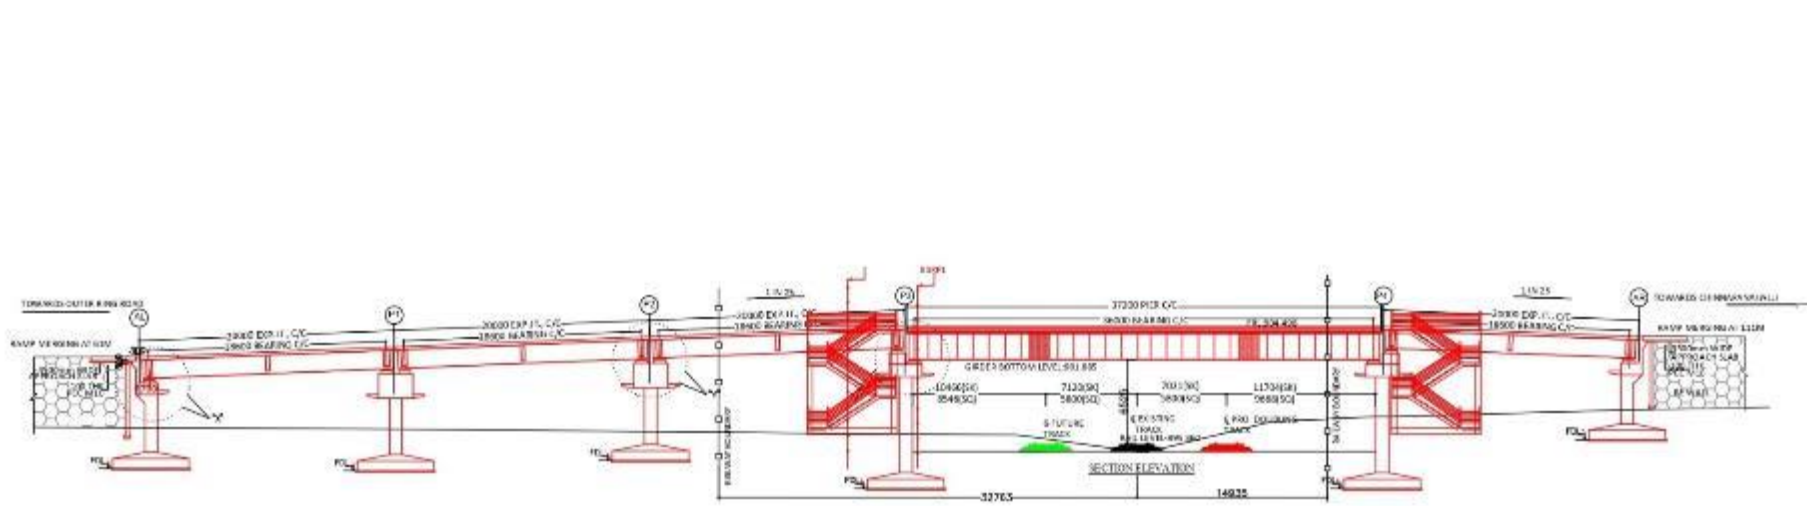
Typical Arrangement of RUB Proposed in BSRP
